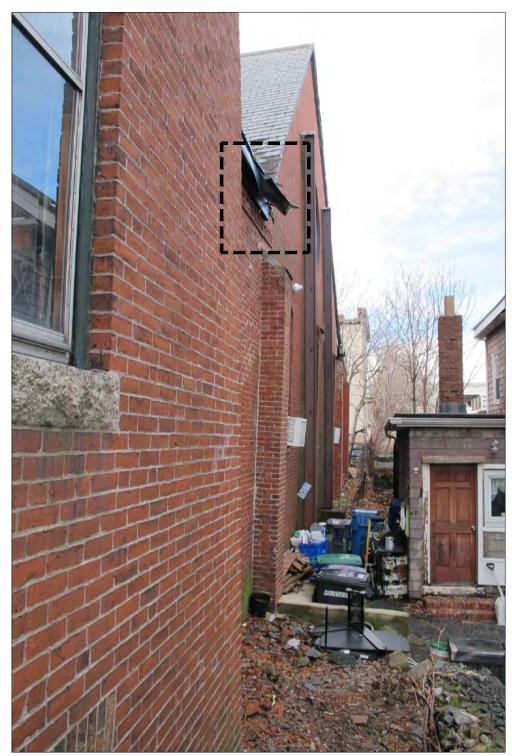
/DRAWING D-200: Damaged flashing and gutter adjacent to cross-gable at the north elevation.
